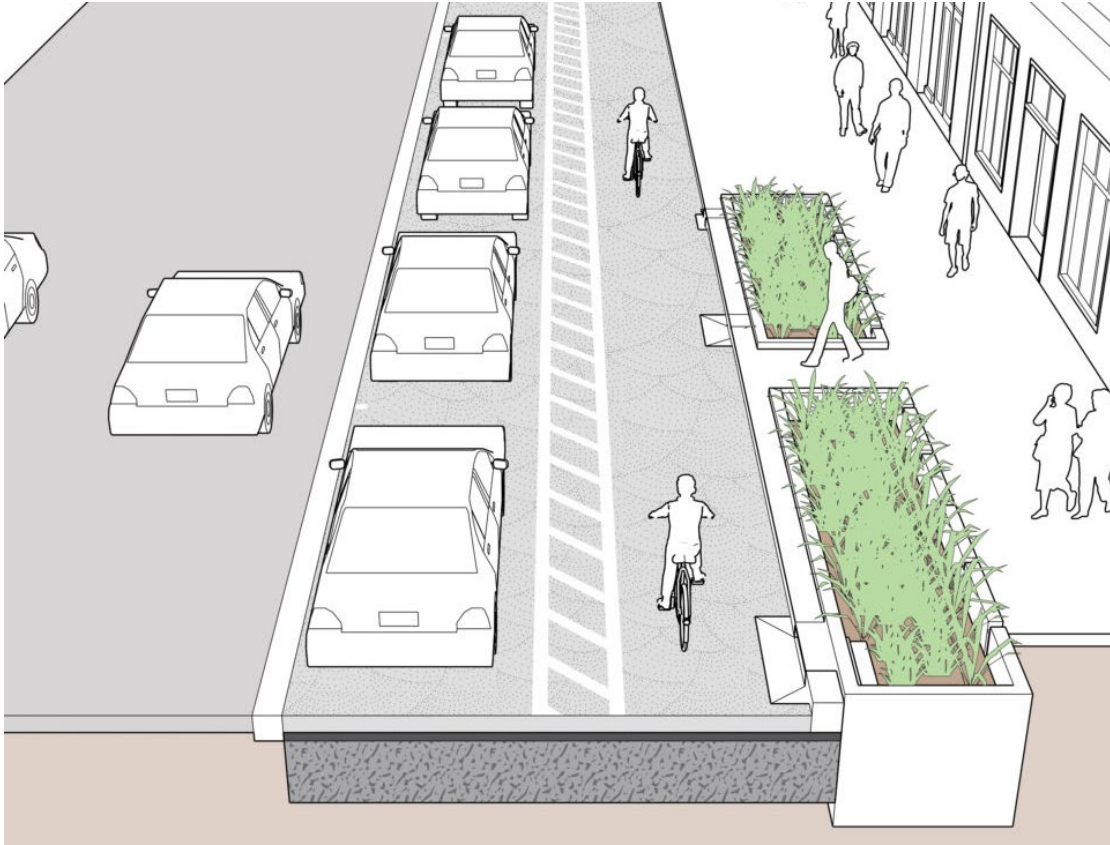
Permeable pavement bike lane and parking with stormwater planters
